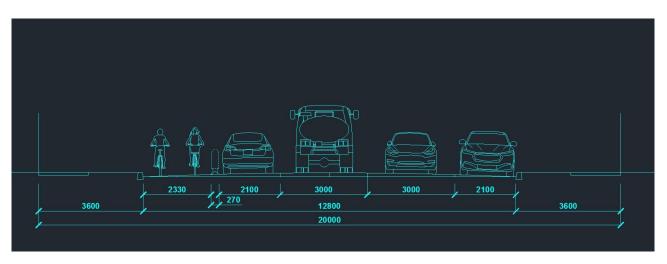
Example of a cycleway installed along Bridge St, Erskineville
